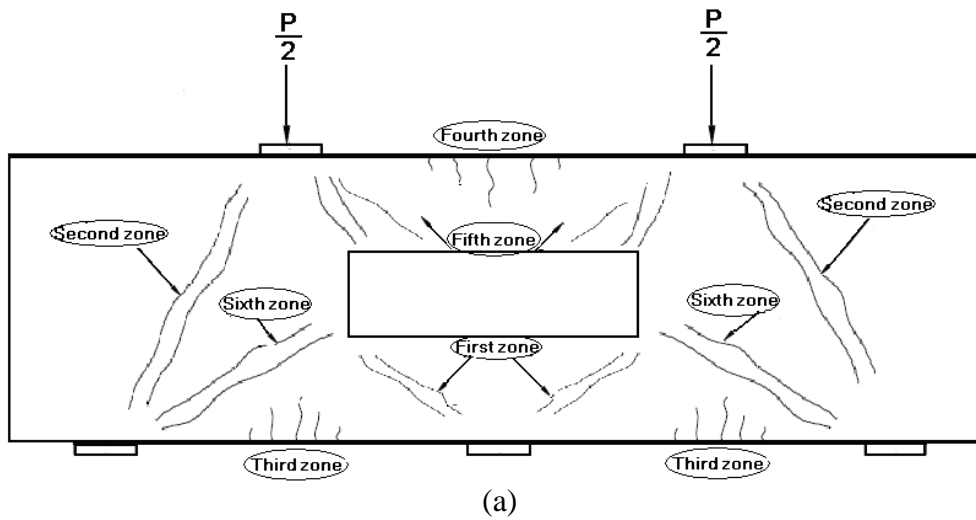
Typical cracking of continuous deep beams with two small square openings and crack pattern of beam HS4
